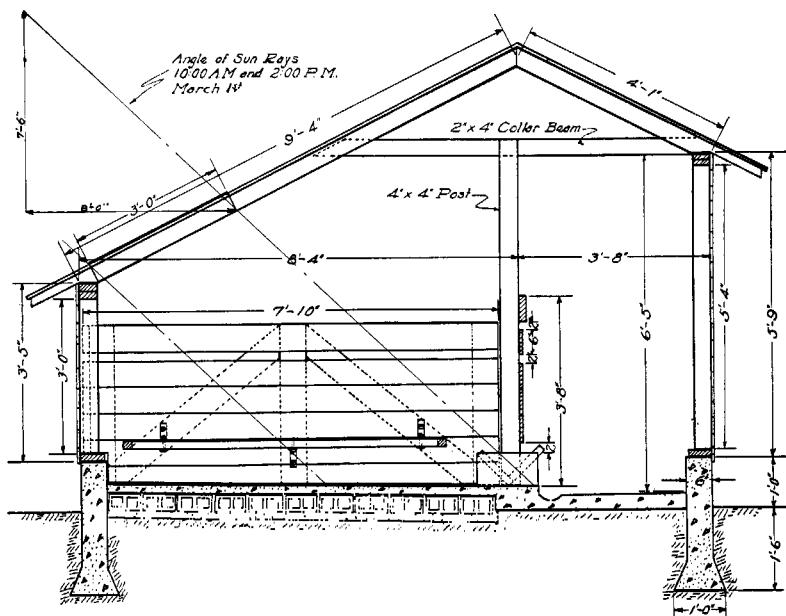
Section through a single-row, combination-roof farrowing house.
